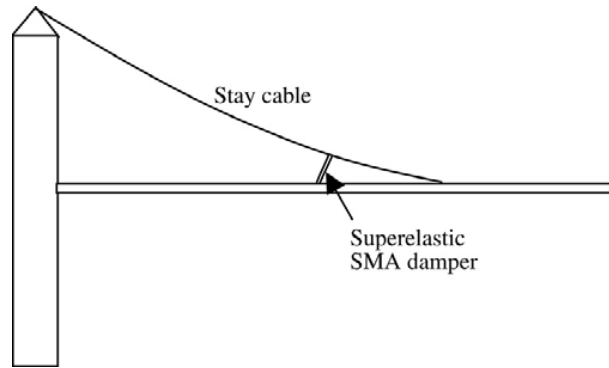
Schematic of the SMA damper for a stay-cable bridge
